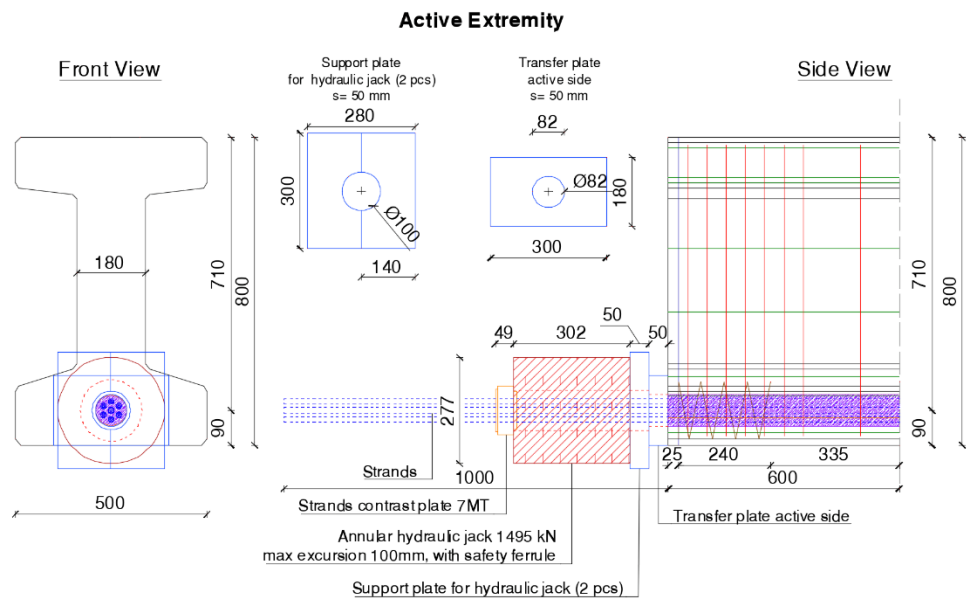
System: plates, ring jack and clamping plate in the active head.
